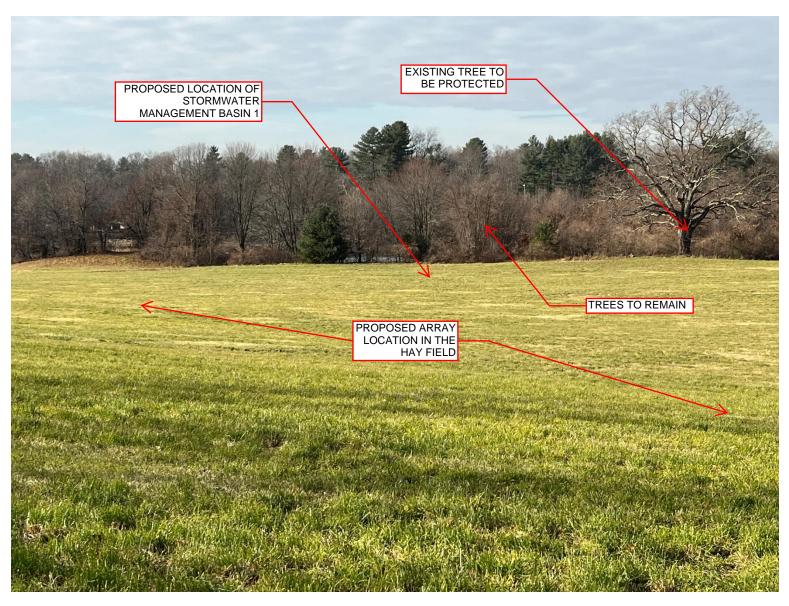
VIEW LOOKING WEST TOWARD SOUTH ROAD FROM NORTHEAST CORNER OF PROJECT SITE
